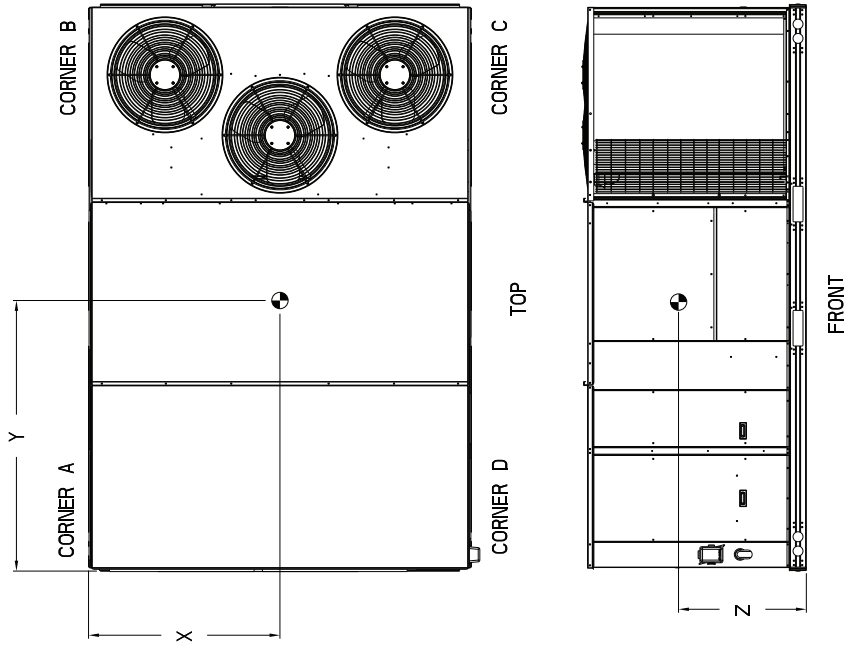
(cont.) - Unit Dimensional Drawing – 14 Size Unit, Sheet 2 of 3
